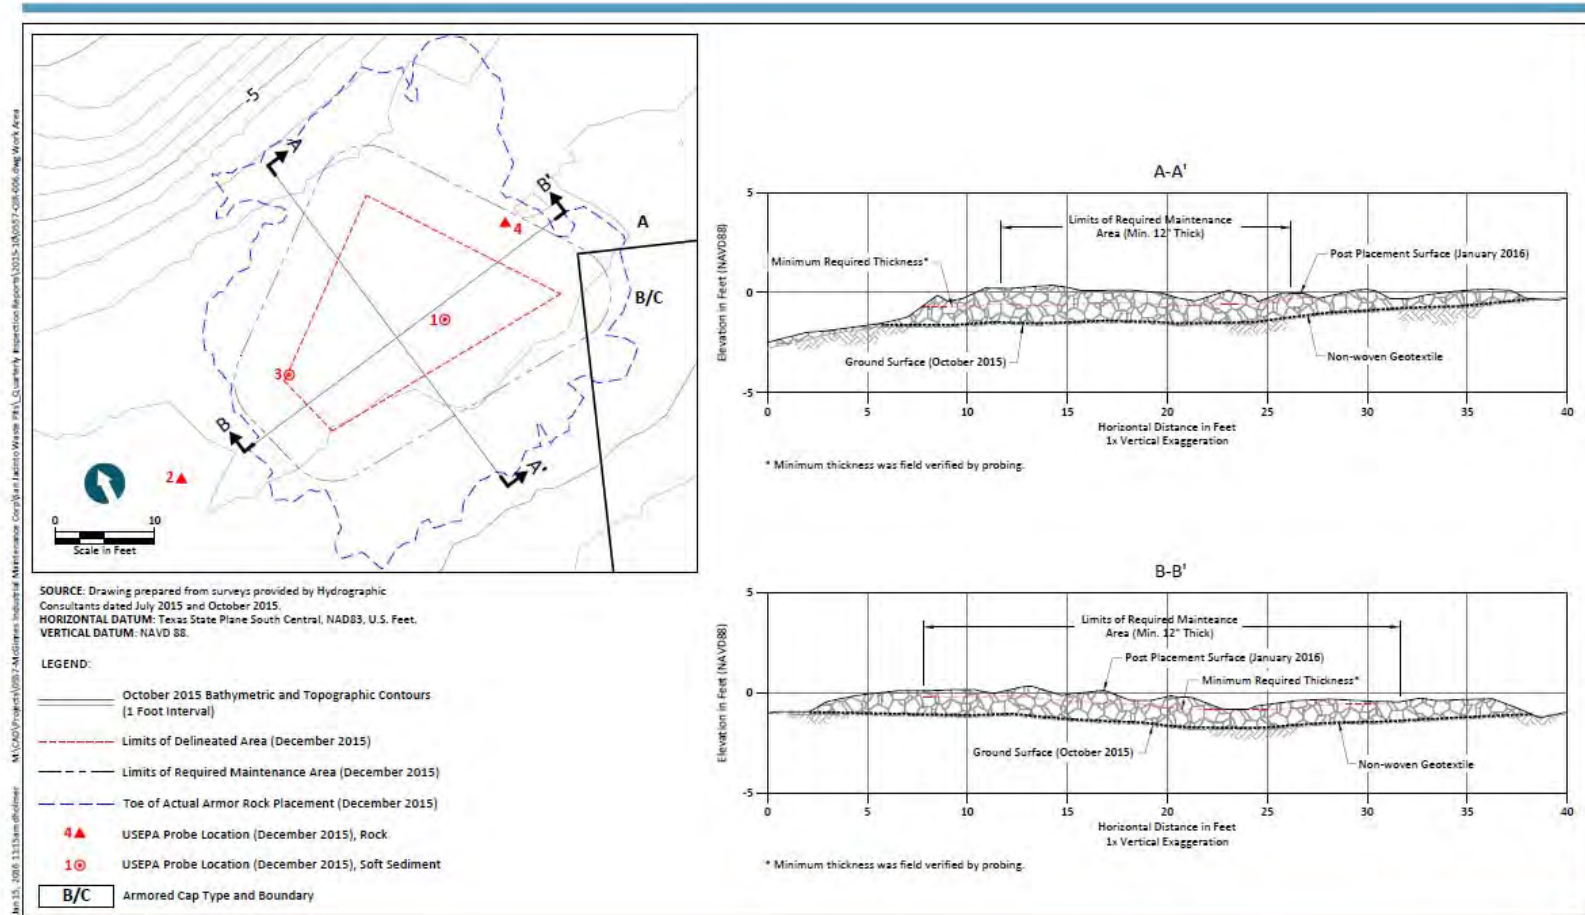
Armor Rock Placement Plan and Cross Sections Post TCRA Inspection
